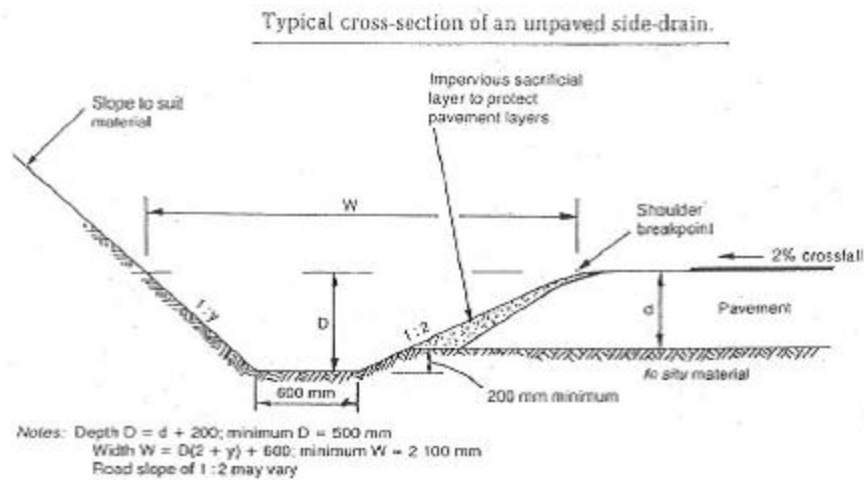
(a): Illustrating a typical cross-section of an unpaved side drain.
